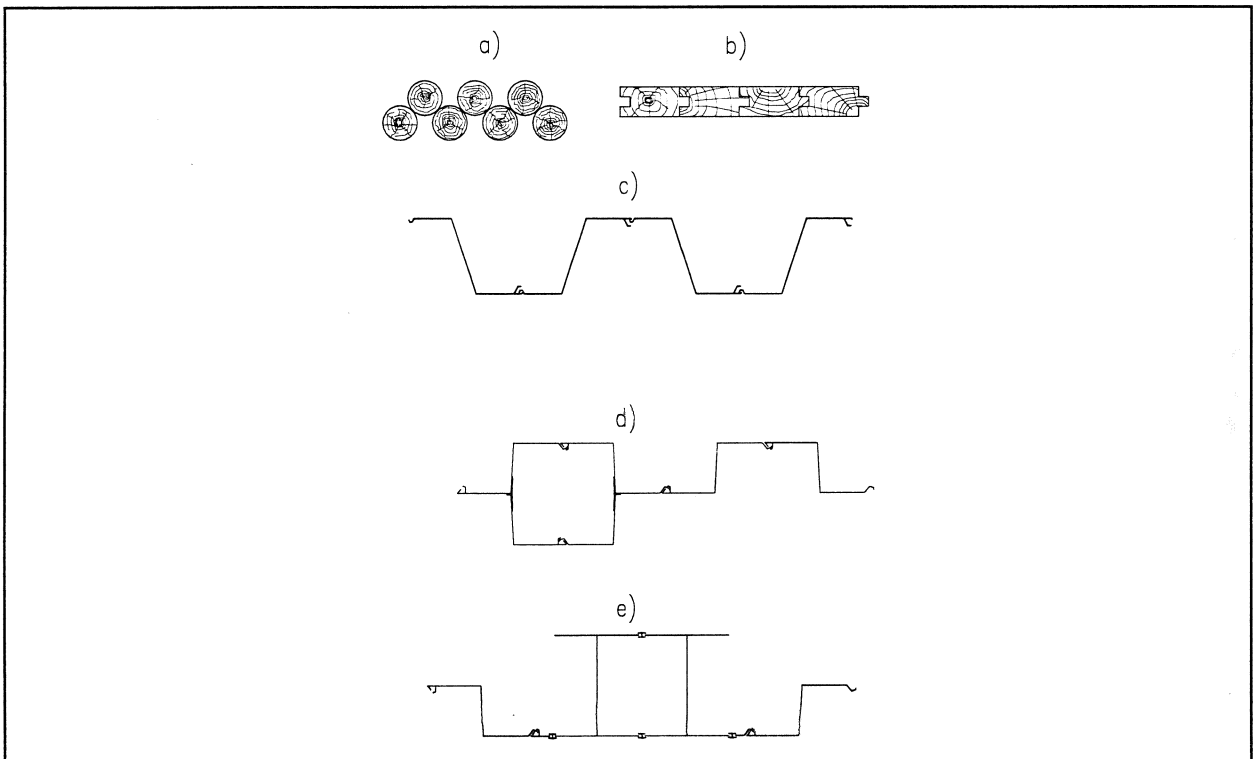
Sheet pile types (a), (b) timber, (c) traditional steel sheet, (d) sheet pile with box pipe and (e) sheet pile with two H-piles.
